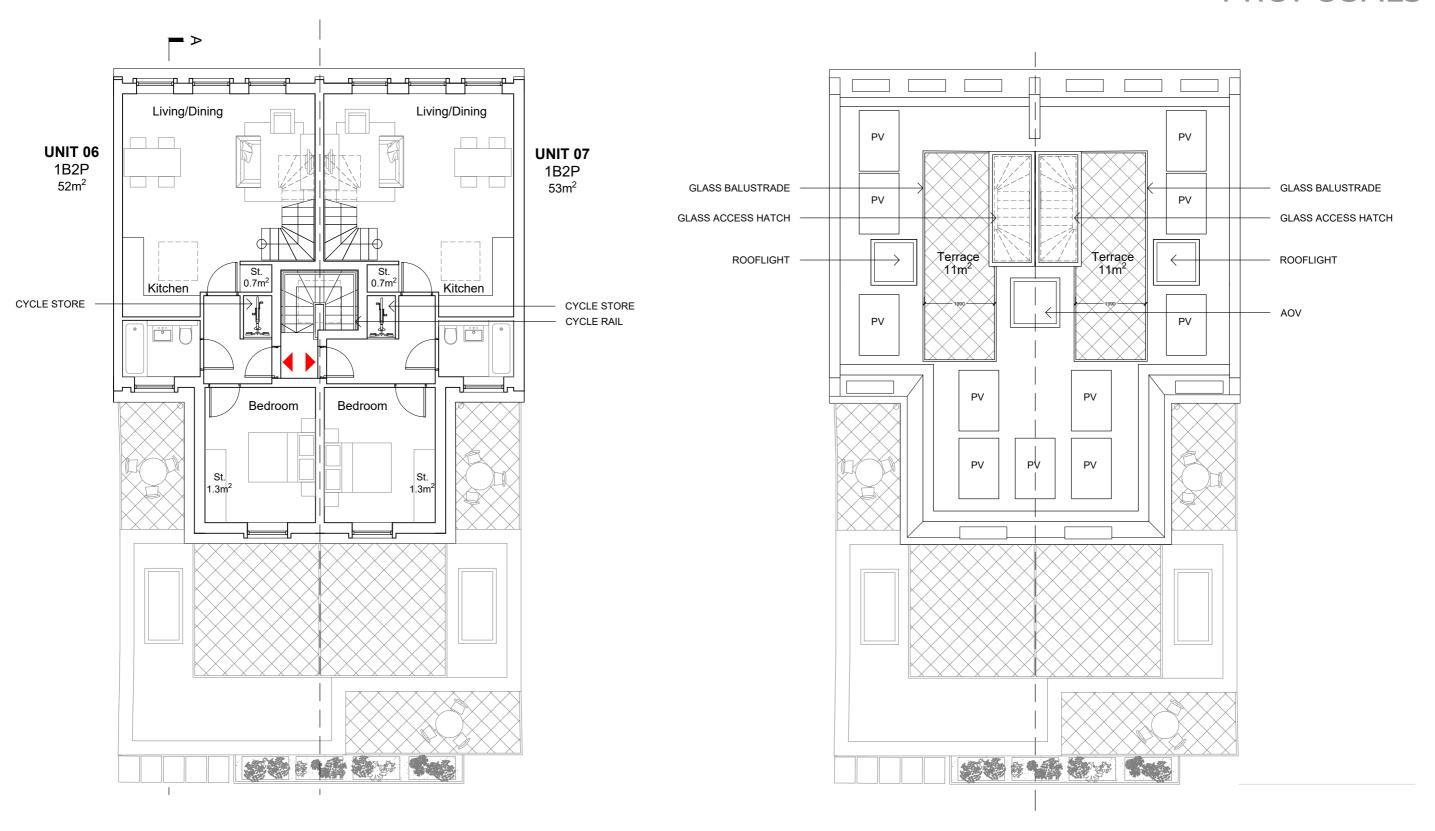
Amended second floor and roof plan (subject of this S73 application)
